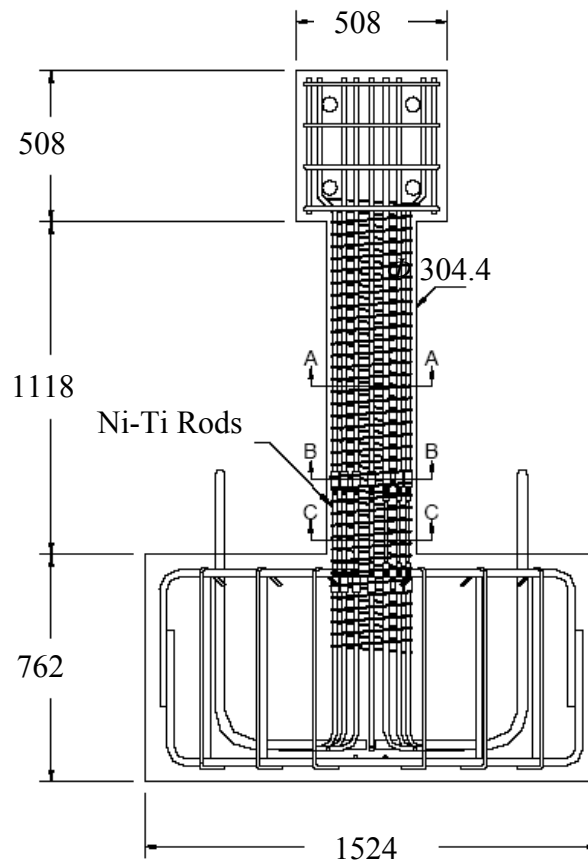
Details of the tested specimen (Saiidi and Wang 2006)
